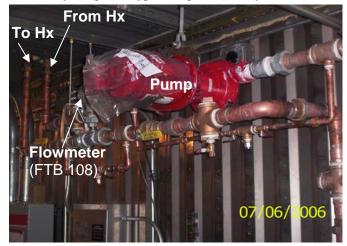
C-1 Pipe and Control Elements (South half – inside of west sidewall)
